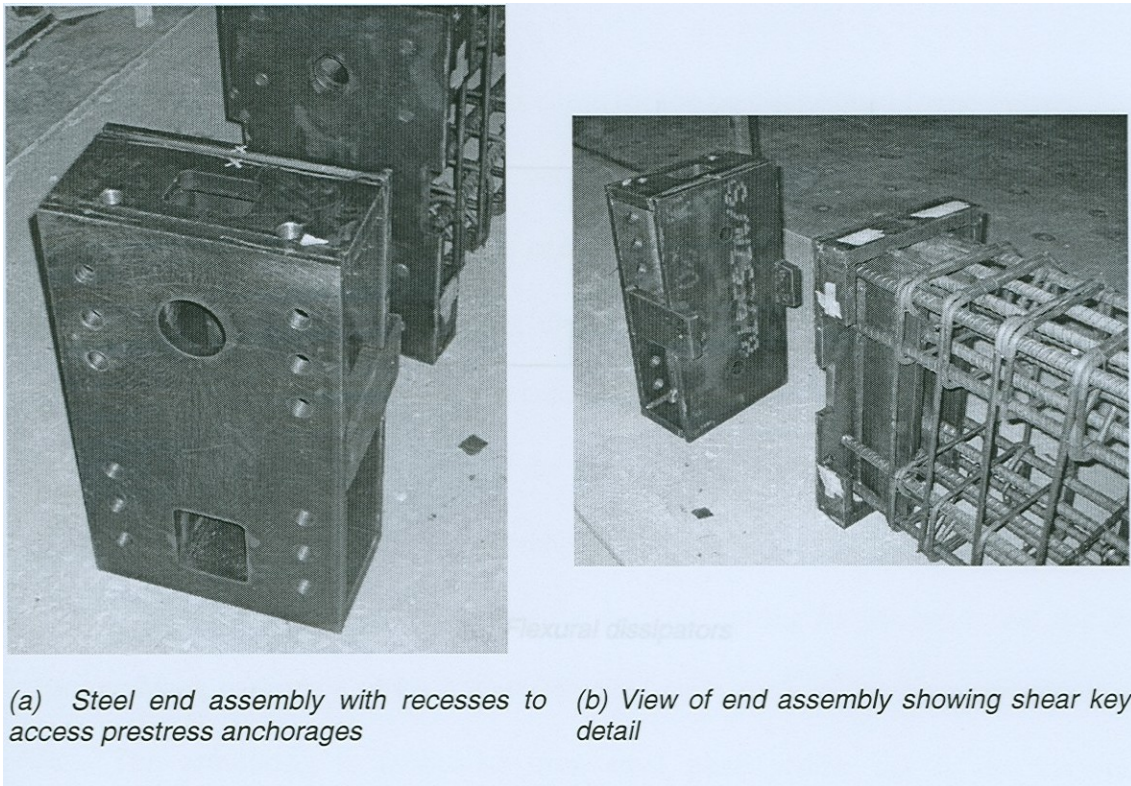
Photographs of the steel endplate assembly (Davies, 2003).
